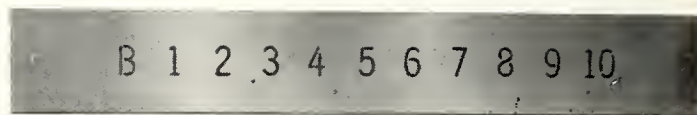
A hall position indicator of the type sometimes installed at the lobby entrance of apartment building elevators. This fixture shows waiting passengers the location of the elevator in the hoistway.
